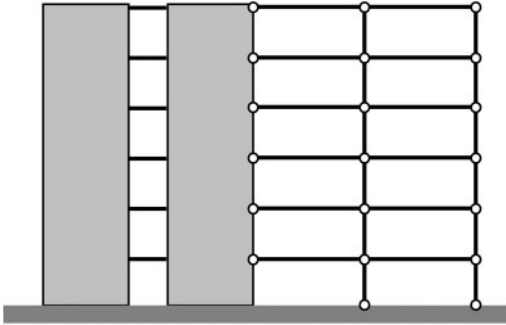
Example of conventional hybrid coupled shear wall system connected to a gravity-resisting steel frame with pinned beam-to-column joints.
